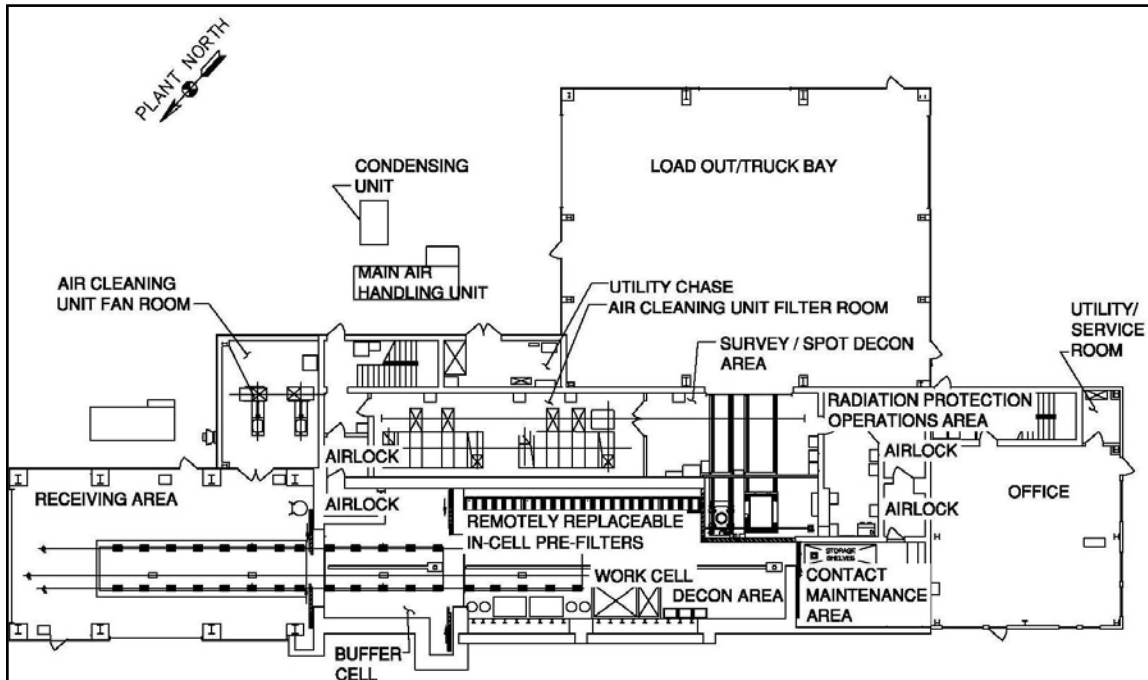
The Remote-Handled Waste Facility First Floor Layout.
